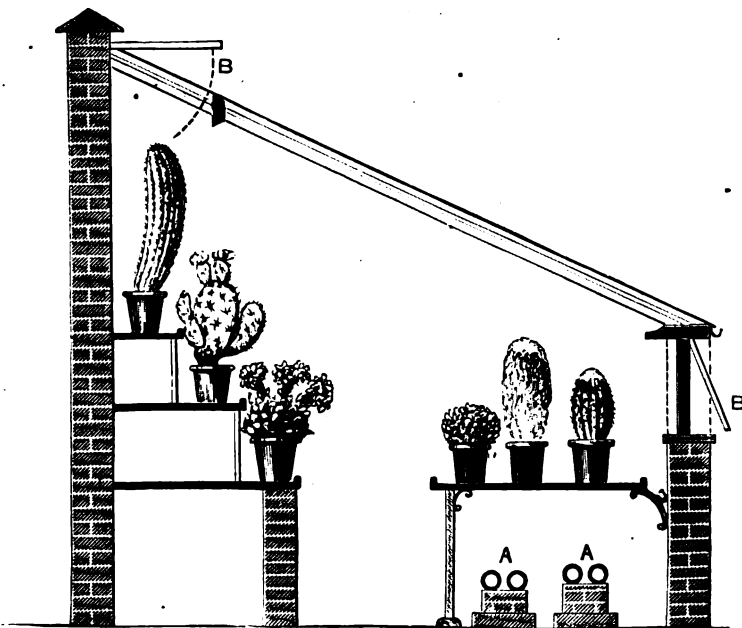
SECTION OF HOUSE FOR CACTUSES. A, A, Hot-water Pipes; B, B, Ventilators.
